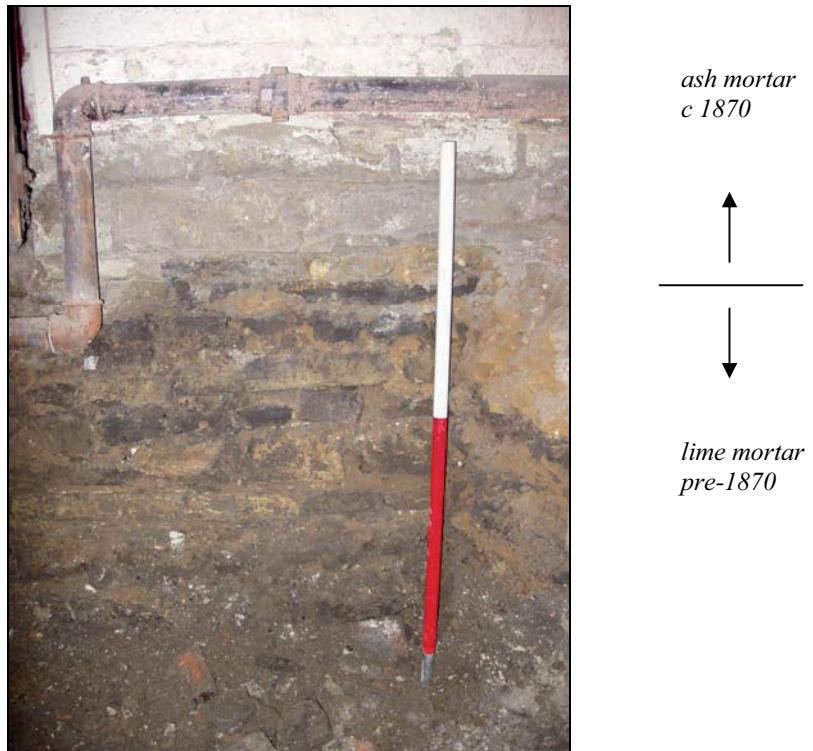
Trench 1, detail of the east wall showing 2 phases of construction, as evidenced by the different use of mortars, from the west
